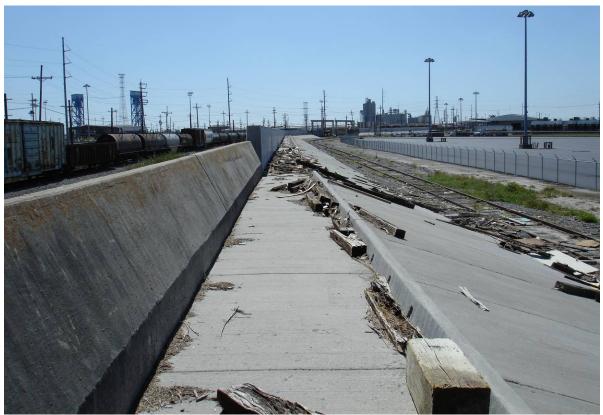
I-wall and splash apron, IHNC west along France Road; New L-wall and splash apron in background (L.Wooten)
